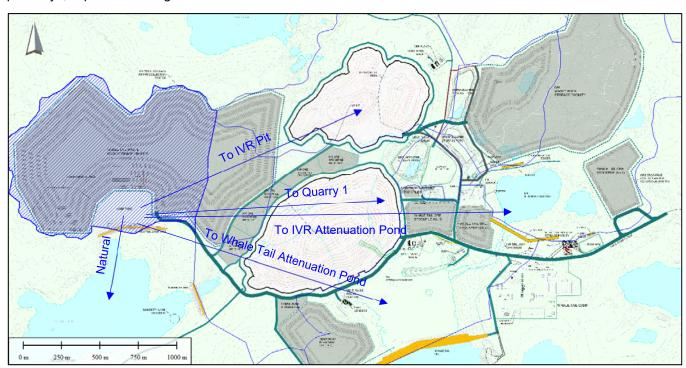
Whale Tail Waste Rock Storage Facility Contact Water Collection System Catchment Overview
